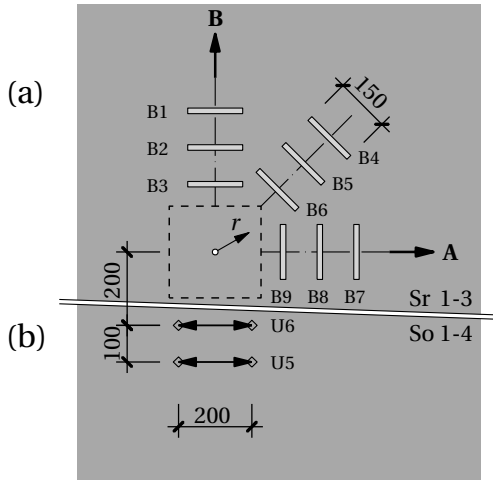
(a) Top view of applied strain gages on bottom surface of Sr1–3. Detailed gage positions see Figure 3.28; (b) tangential in-plane deformation measurements of So1–4. All dimensions in [mm]
